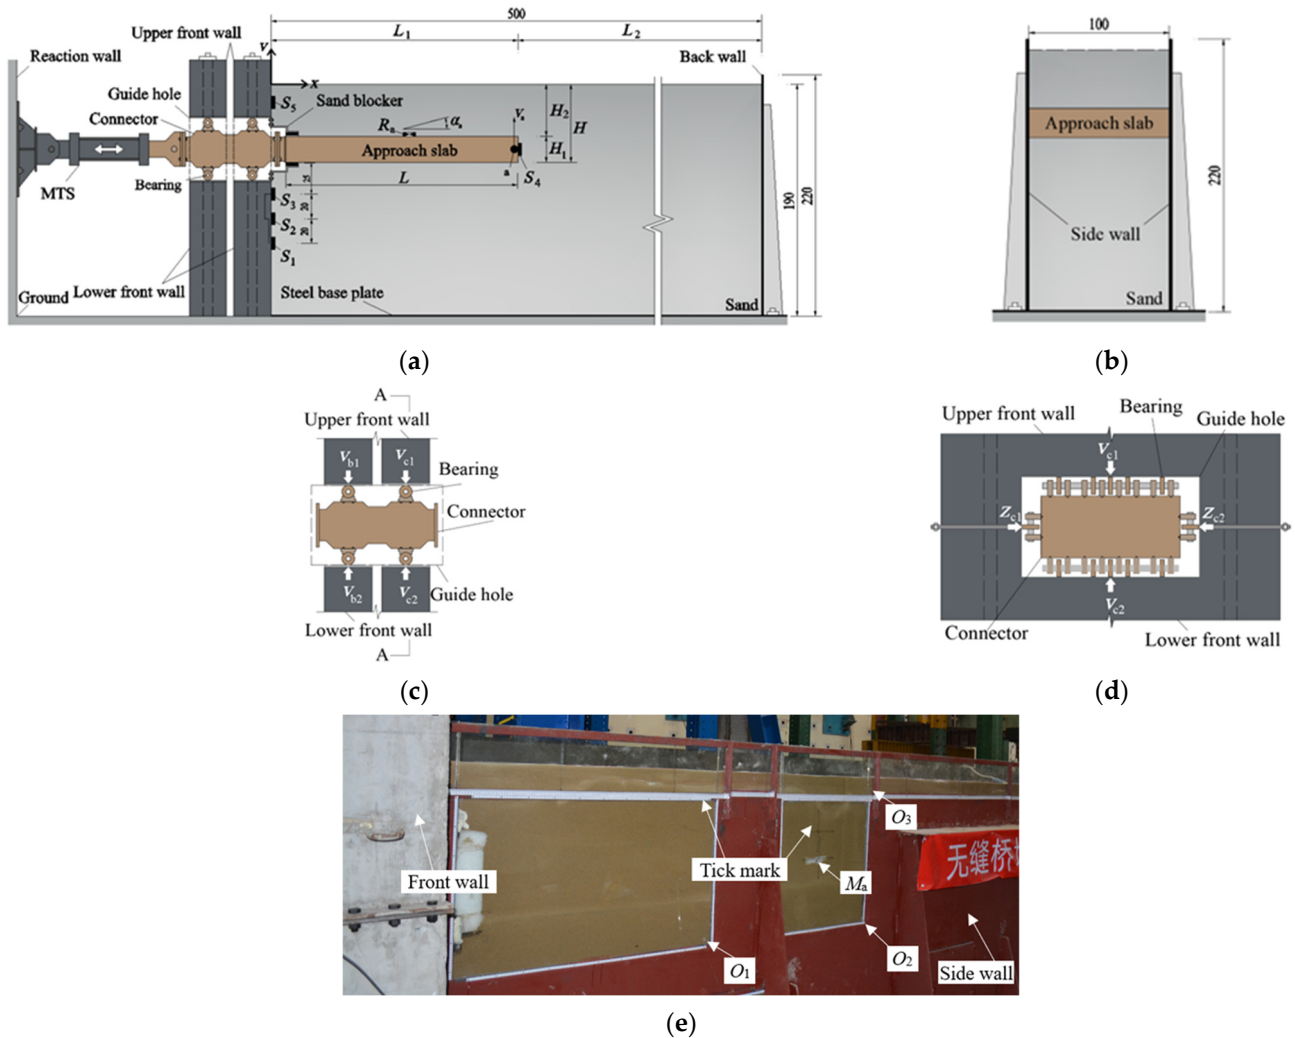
Test set-up and rigid container: (a) longitudinal sectional diagram of test set-up; (b) transverse sectional diagram of test set-up; (c) longitudinal section of guide hole; (d) section A-A of guide hole; and (e) photo of the side wall with observation windows.
